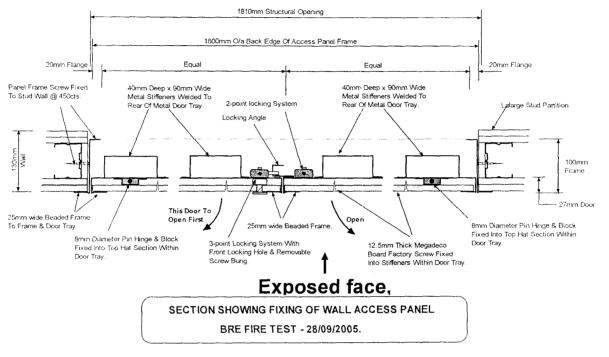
Showing a horizontal section through the access panel. (view is from below)
